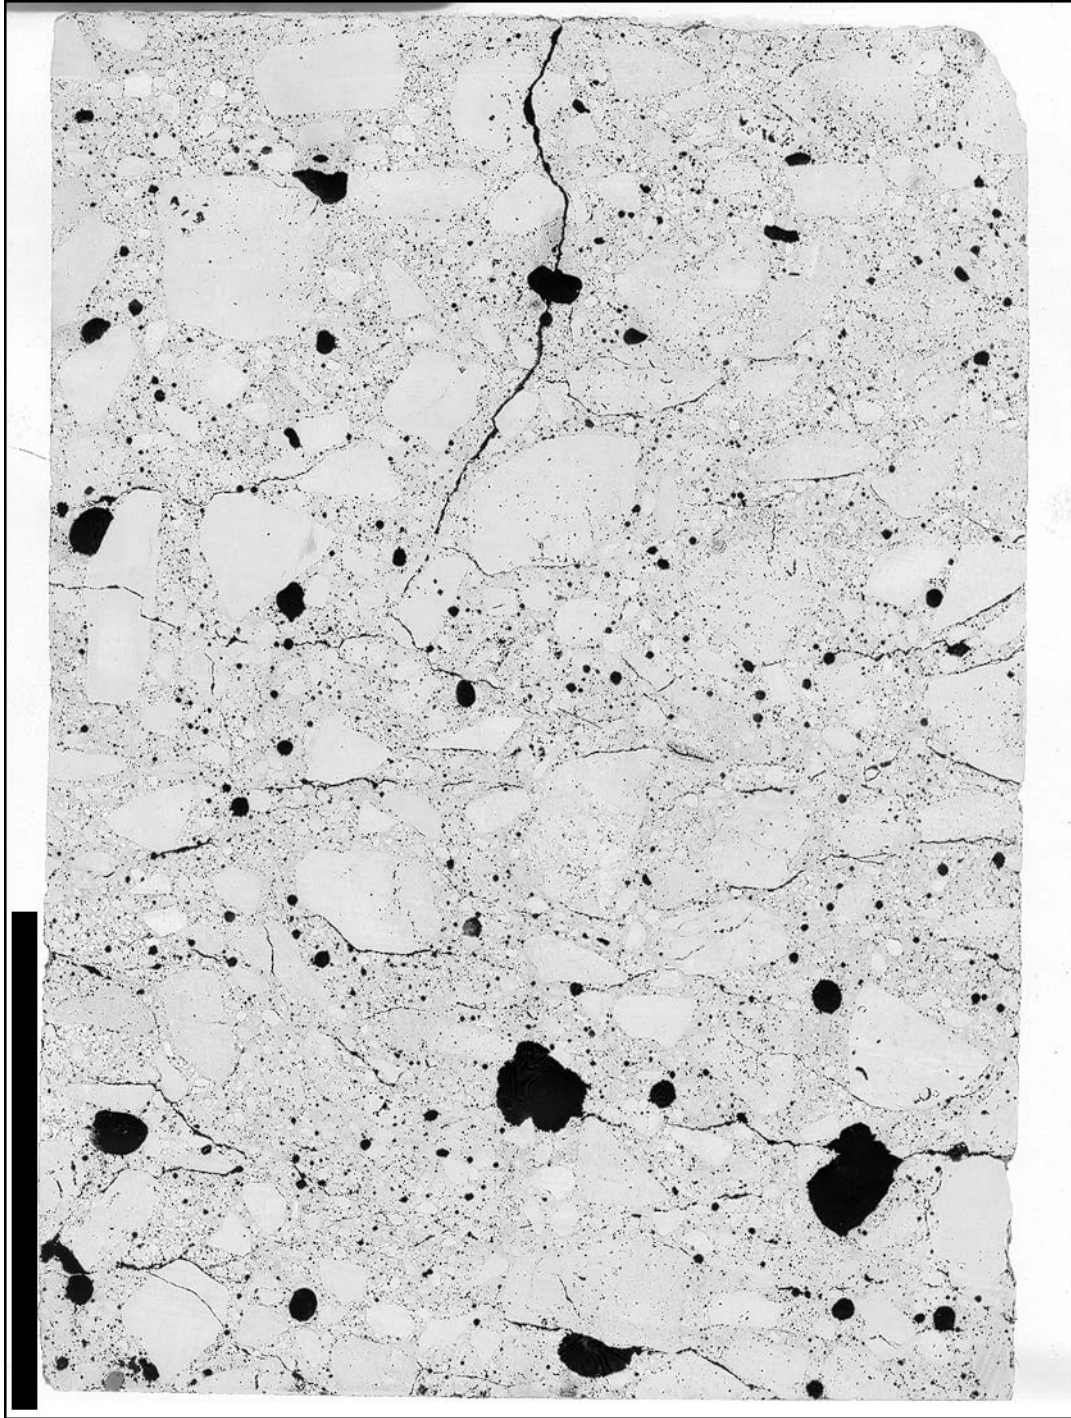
Close up of top half of sidewalk portion of core "2" to show cracks, scale bar 5 cm.
